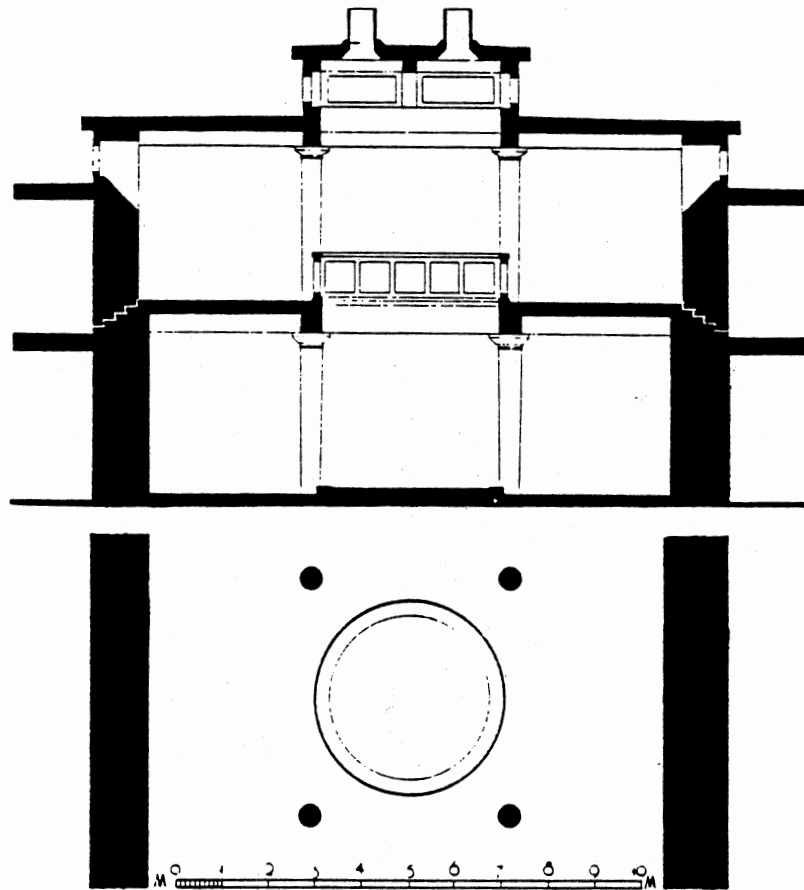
Plan of Hearth Area in Throne Room of Palace at Pylos
